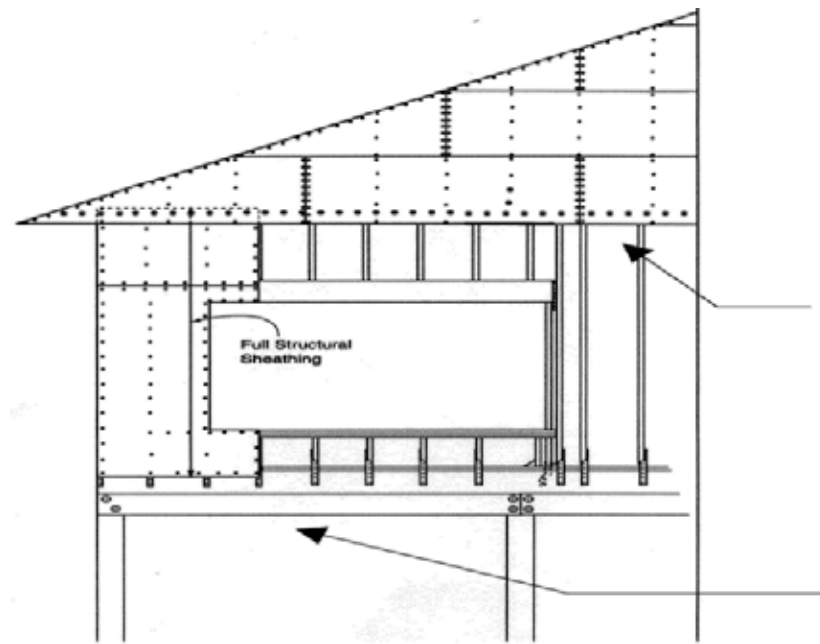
Example of how wall sheathing should overlap the gable wall-side wall connection.
